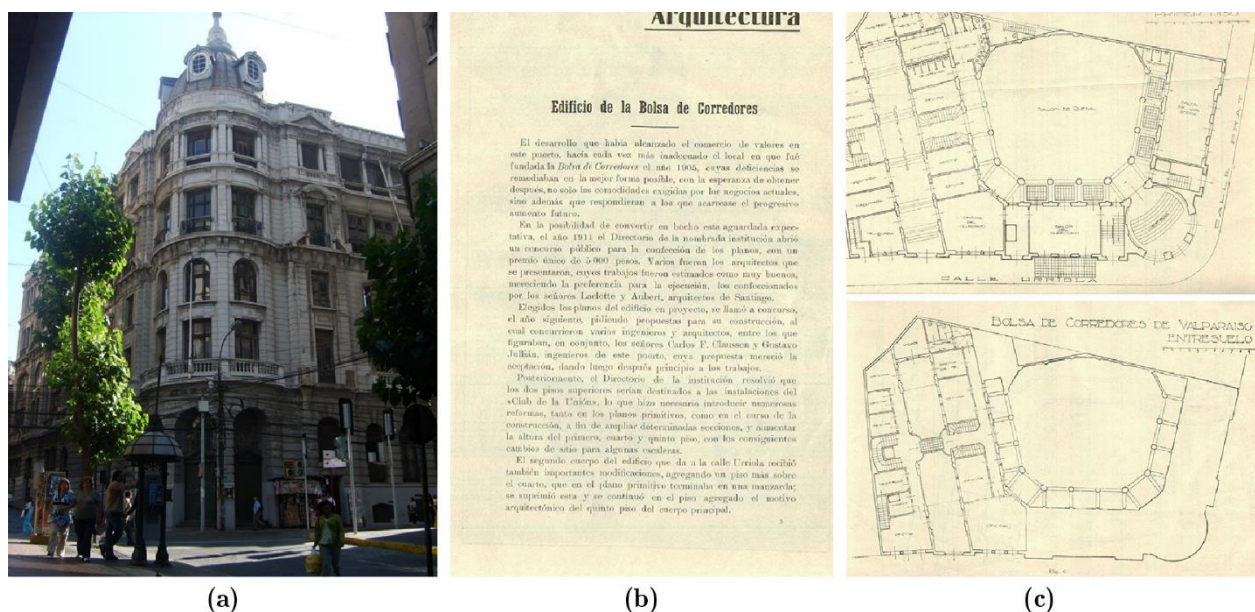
Typical mixed iron-reinforced concrete building (Bolsa de Valores de Valparaíso): (a) façade, (b-c) technical report and plan of the ground level.
